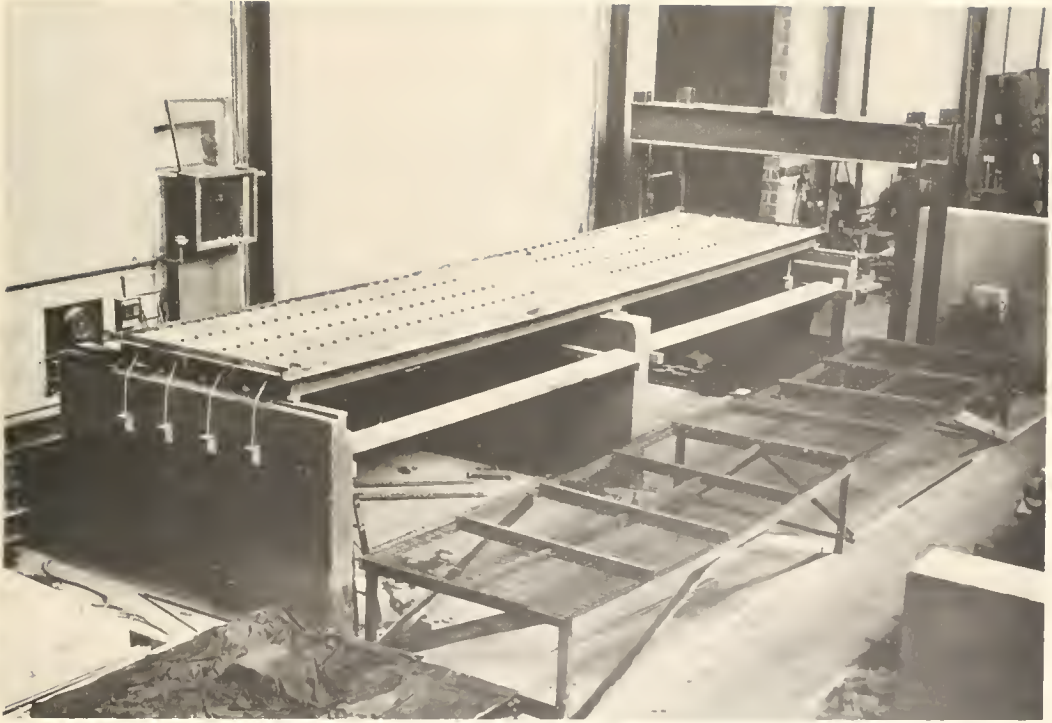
FORMS AND REINFORCEMENT FOR BRIDGE X30
